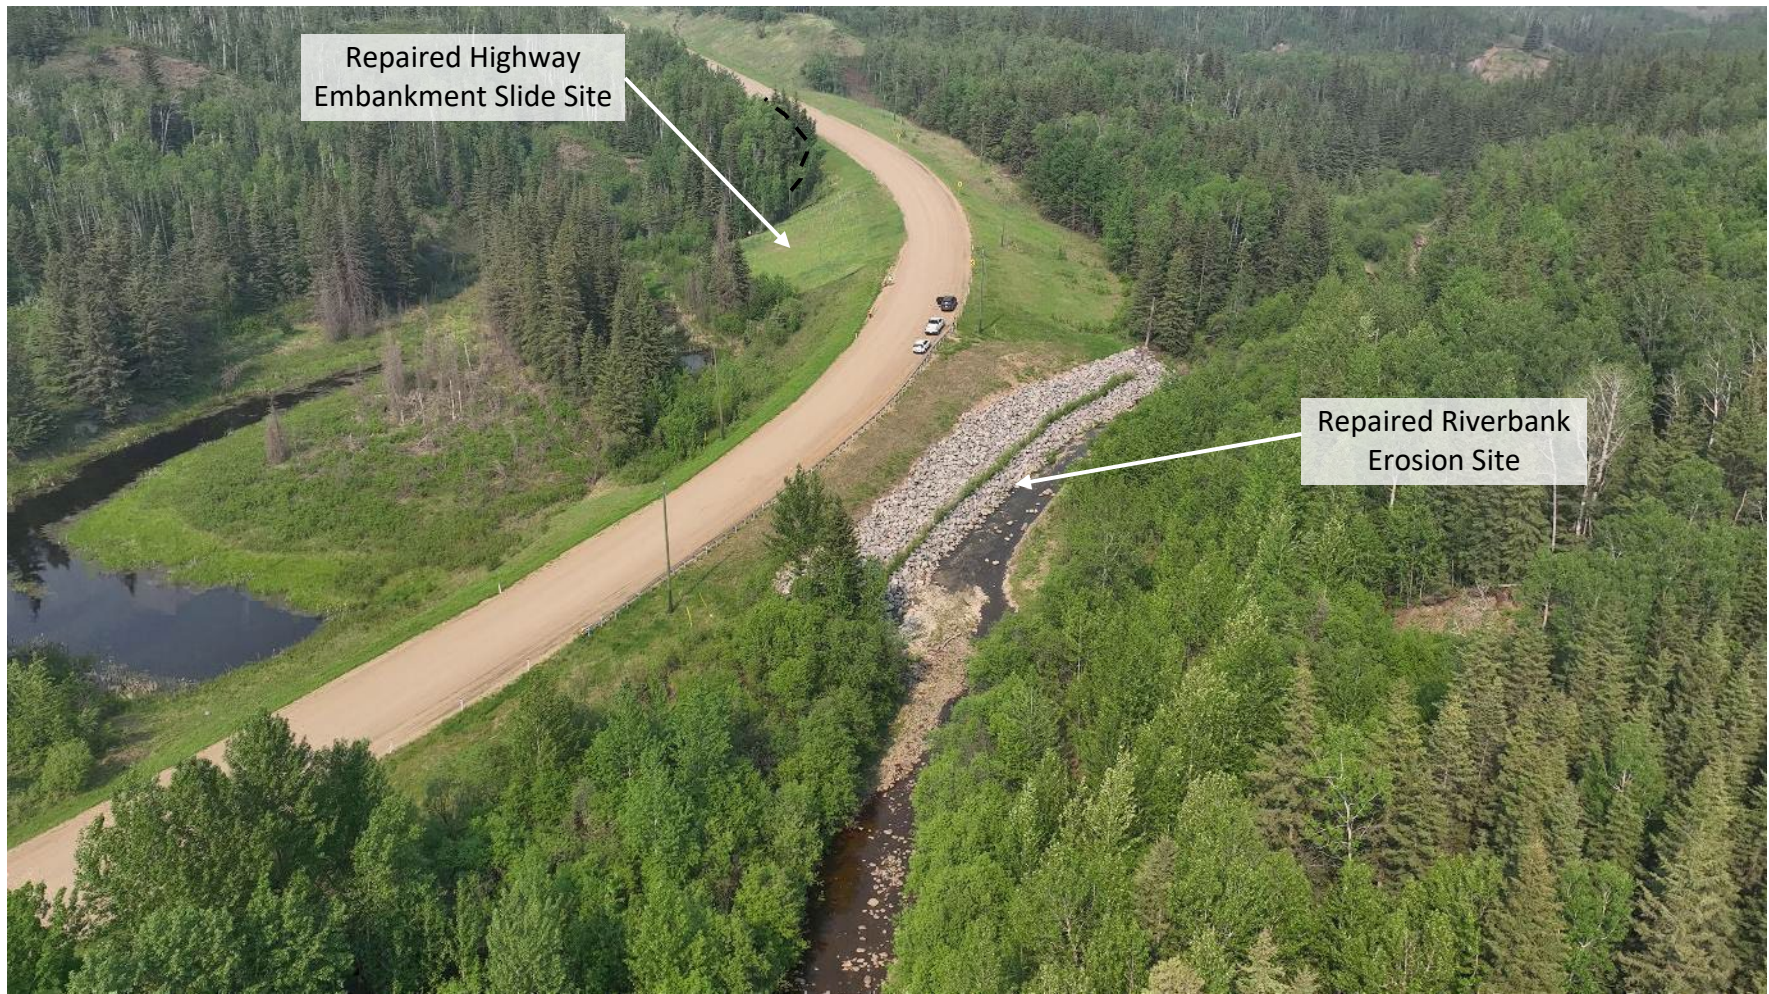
Repaired highway embankment slide on northwest side of Hwy 736:02. UAV photo taken June 3, 2025, facing east.
